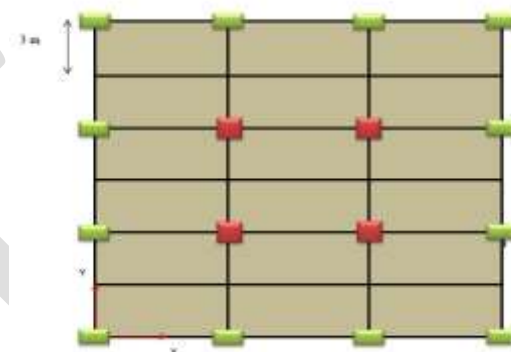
Models I - Slab with Main and Secondary Beam at Spacing 3m
